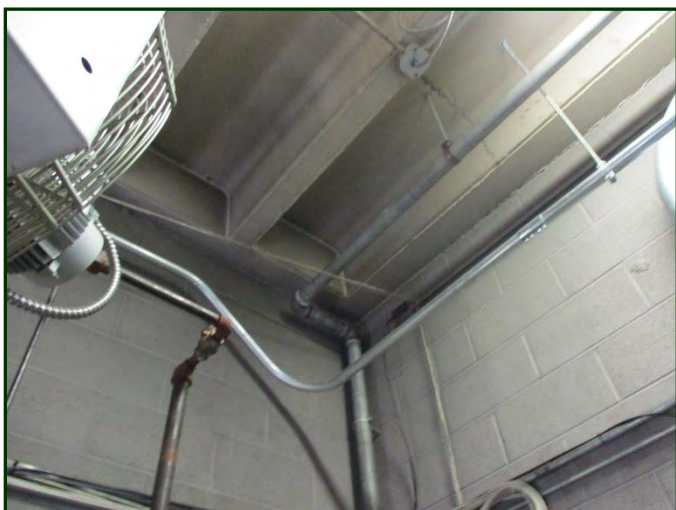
Superstructure at boiler room with cast-in-place concrete roof structure on load bearing CMU walls
